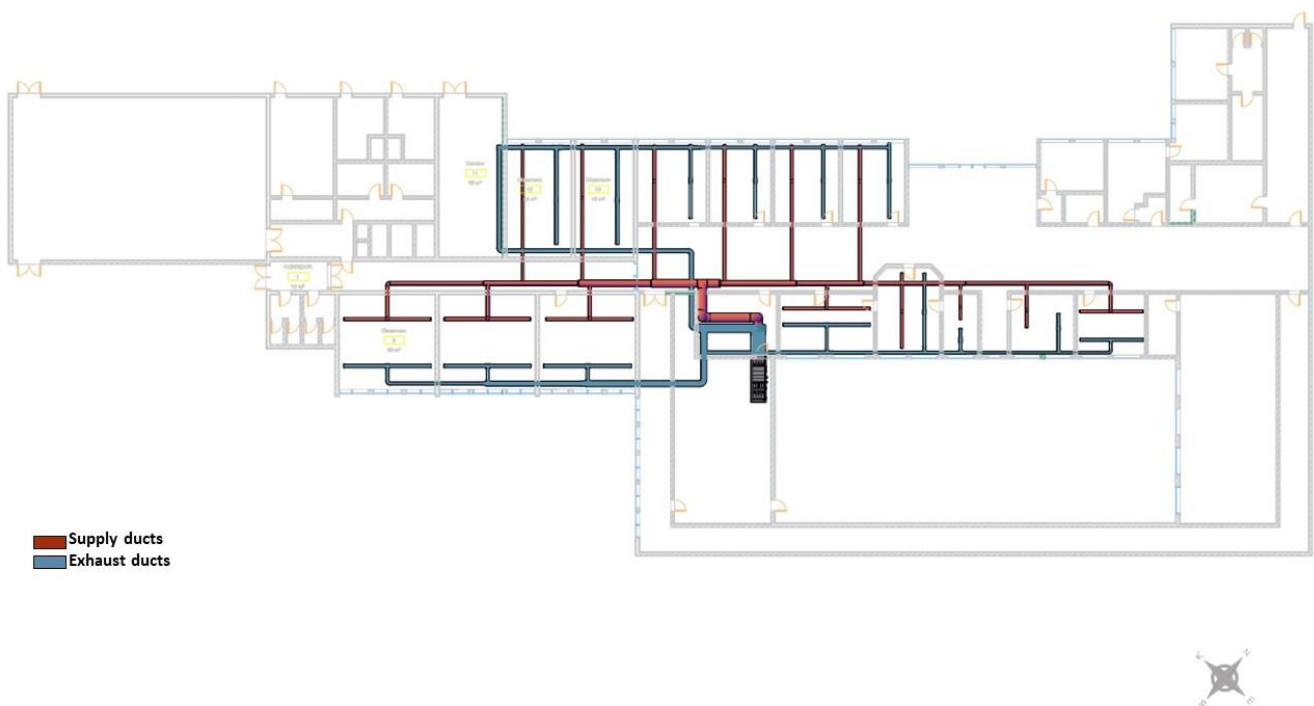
Ventilation layout for the school building applying Prihoda tailor made fabric ductwork.
